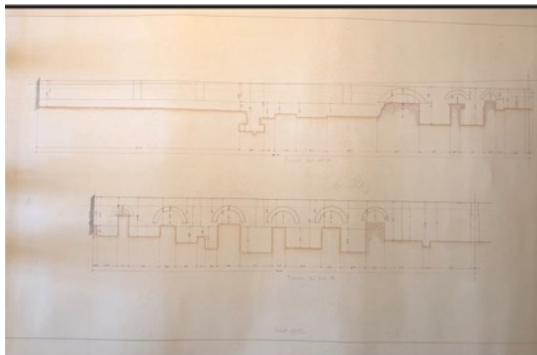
Key plan for foundation sections of the third construction phase of IAM buildings (“IAM-Archive, 102, G3/R3/13”, n.d.).
